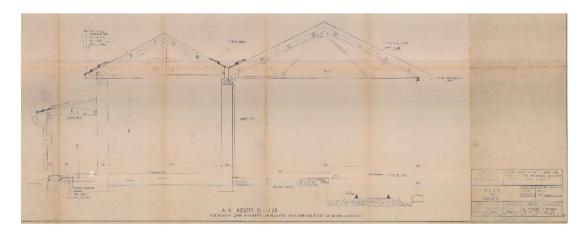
Drawings of Warehouse Building in 1966 (TCDD Archive)
